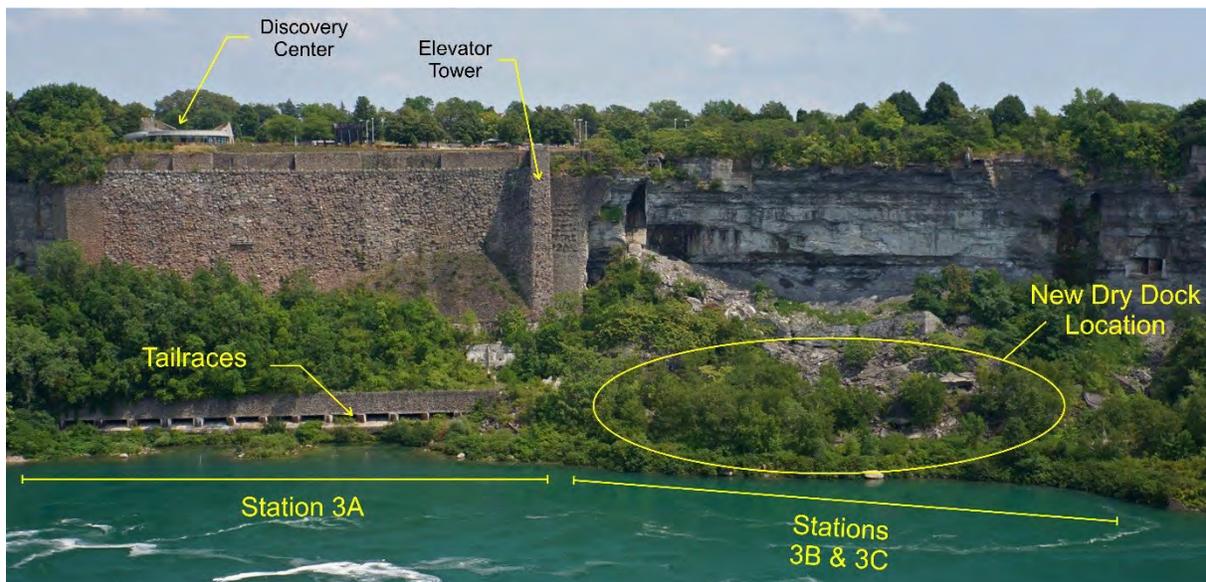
View of the Schoellkopf site looking east from Canada, prior to dry dock construction. Note the locations of the former Schoellkopf power plant stations.
